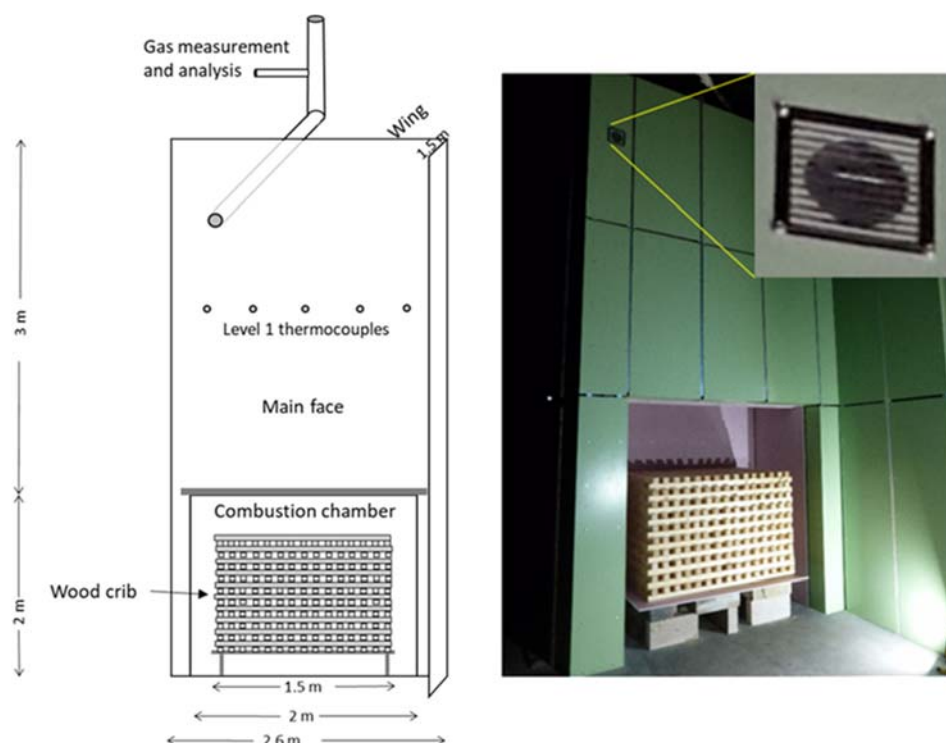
Diagram of the test wall configuration and photograph of test set up. Inset shows the external face of the kitchen vent
